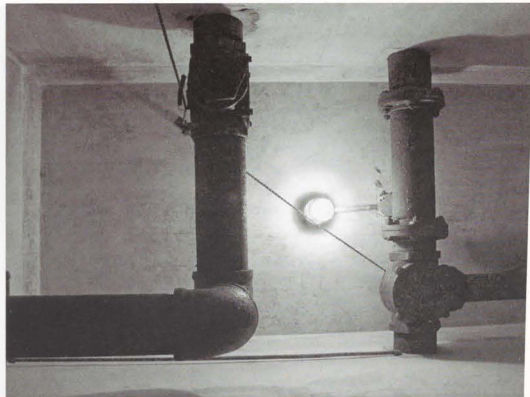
(Above). East end of gas-proofing room. The cannister filters and air pumps that formed the gas-proofing equipment would have occupied this space, connected to the two down-pipes. Graffiti in these photos was removed by work crews in September 2008.
